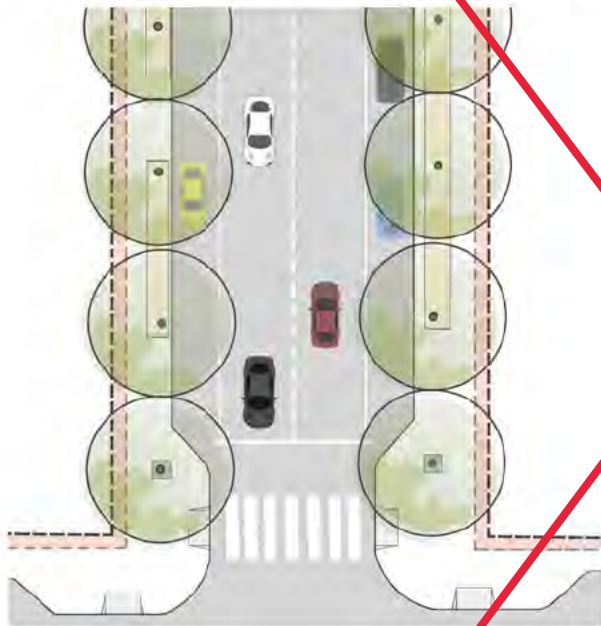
(1). 200 E and 400 E Cross Section and Plan-view
